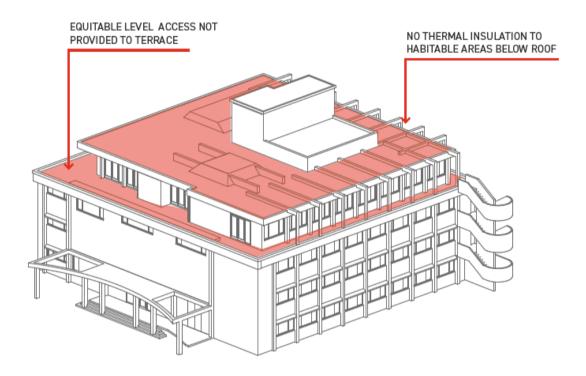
3D model highlighting the current issues proposed to be solved by the new roof. Source: Lahznimmo + Antelope, 2021
